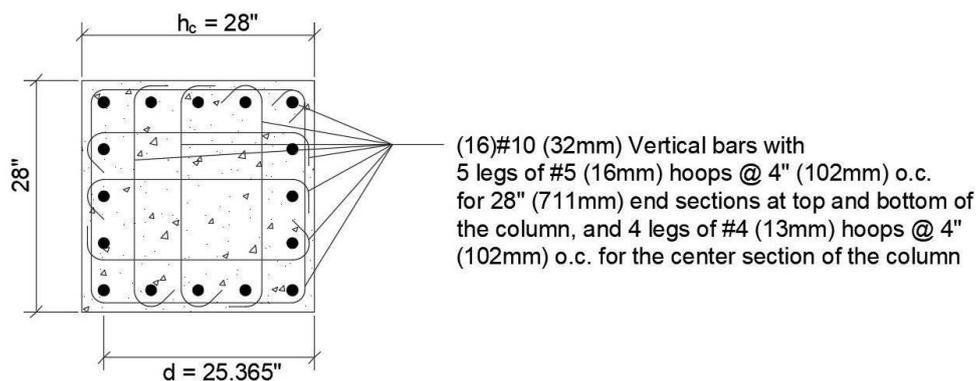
Exterior first floor column including tsunami design (1" = 25.4mm)
